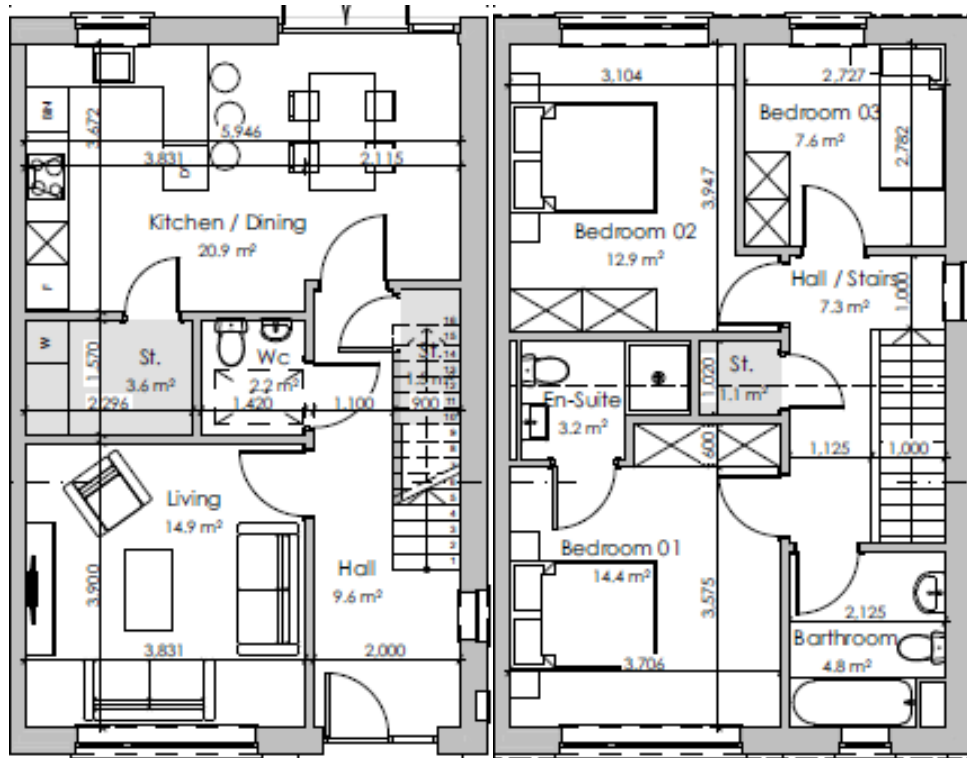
Ground (l) and first (r) floor plans of House Type 3.8.
